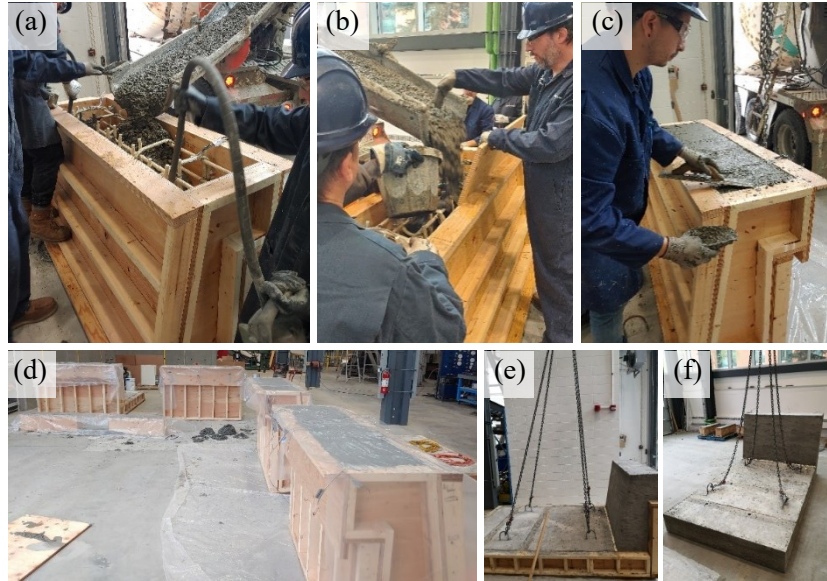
2nd concrete pour. (a) Concrete mix pour while vibrated, (b) Concrete pour into formwork of specimen 1, (c) Surface finishing using wet trowel, (d) specimens under curing process after casting was finished, (e) removal using crane system from facility, and (f) Structure without formwork.
